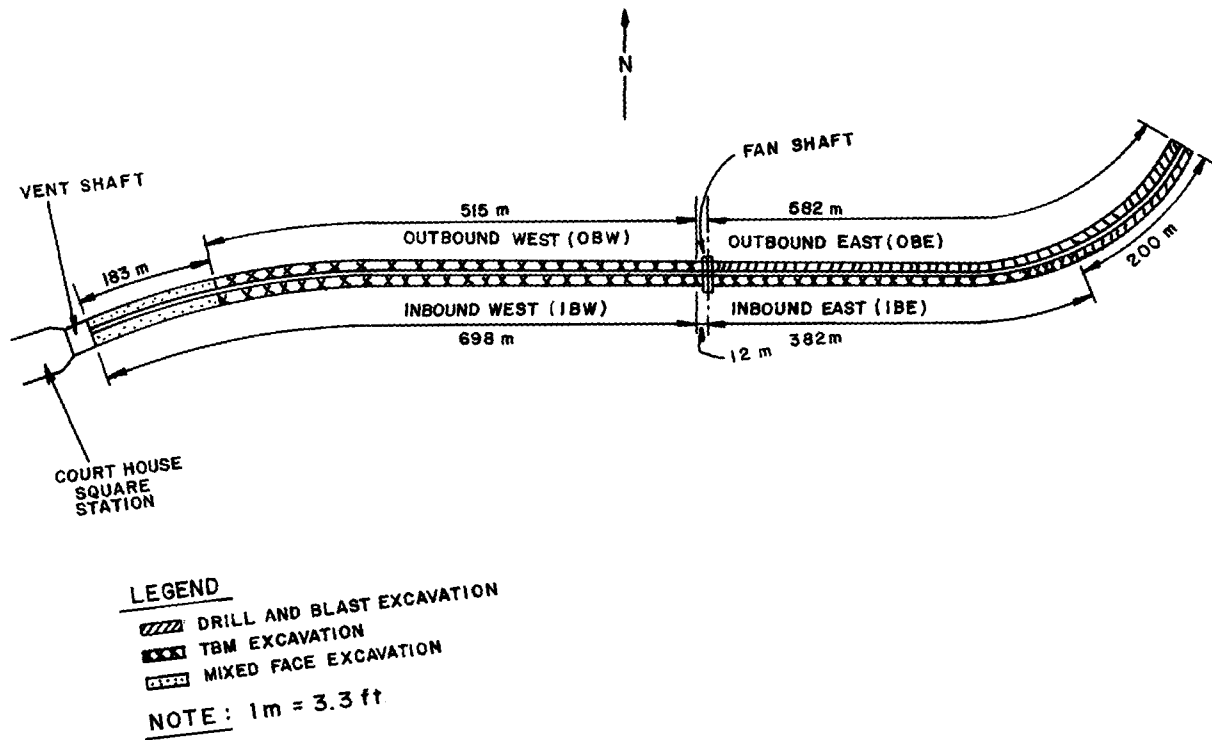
Plan of WMATA Section K-1 Tunnel (Garbesi, 1979)
